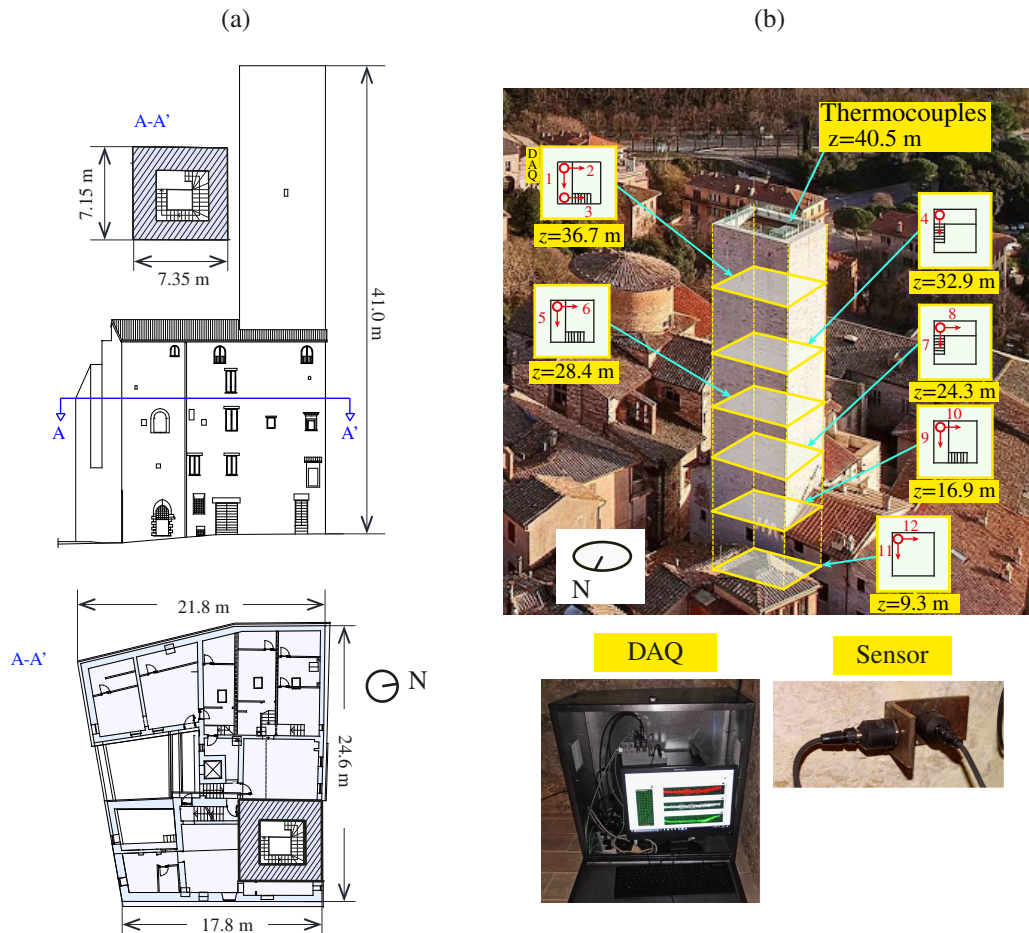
Elevation and plan views (a), and sensors layout for continuous monitoring of the Sciri Tower (b).
